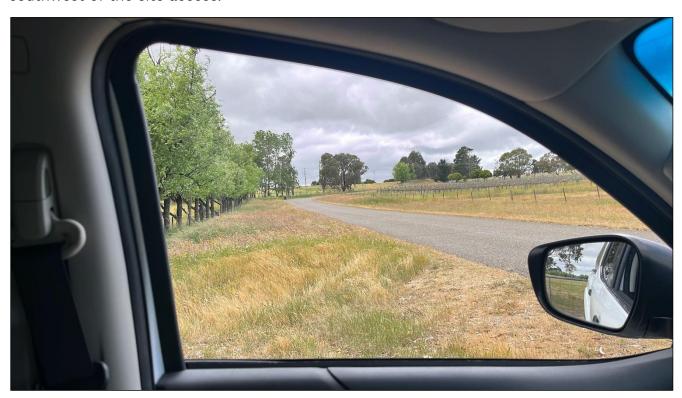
At the intersection of the site access driveway and Turton Place facing northeast
